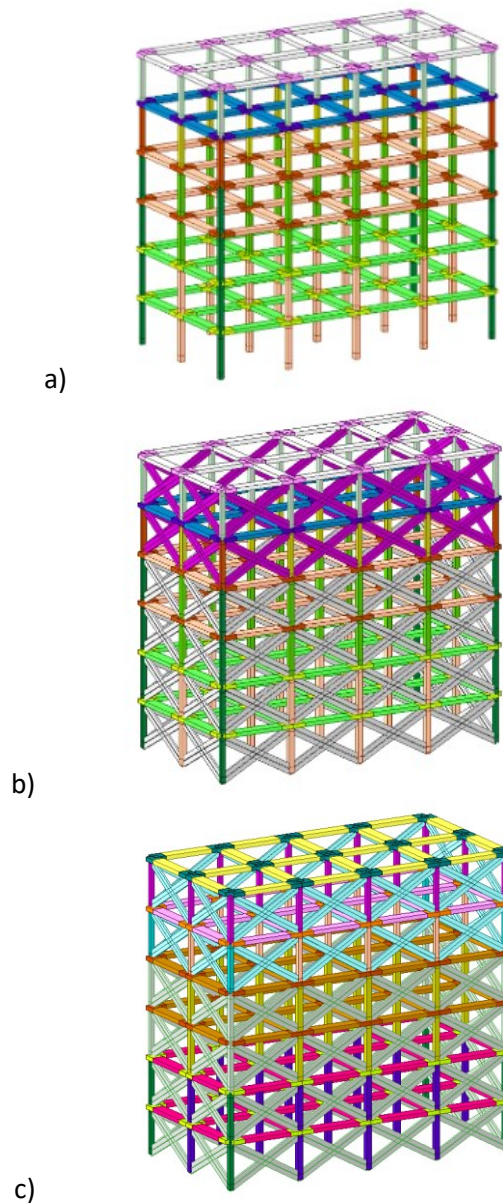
FEM model of the bare frame building (a), with the URM infill walls (b) and with RBB infill walls (c)
